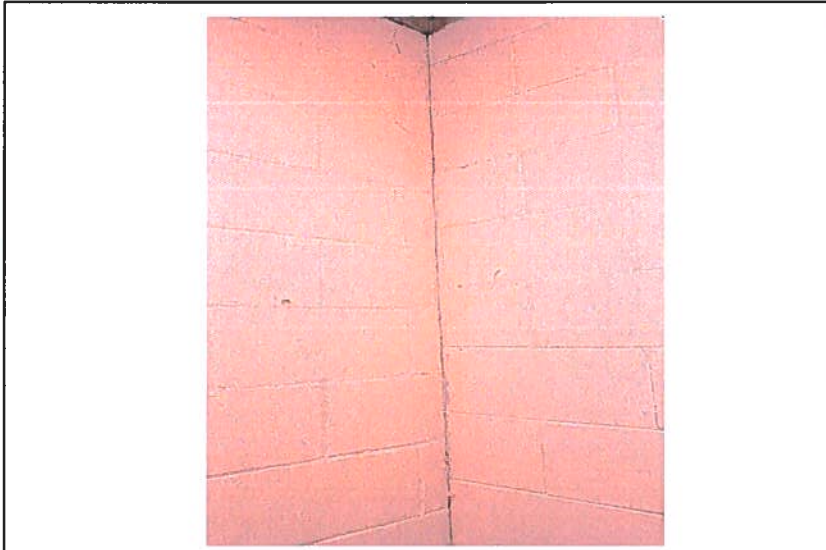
Mortar Joint Cracking in West-Side Stairwell
